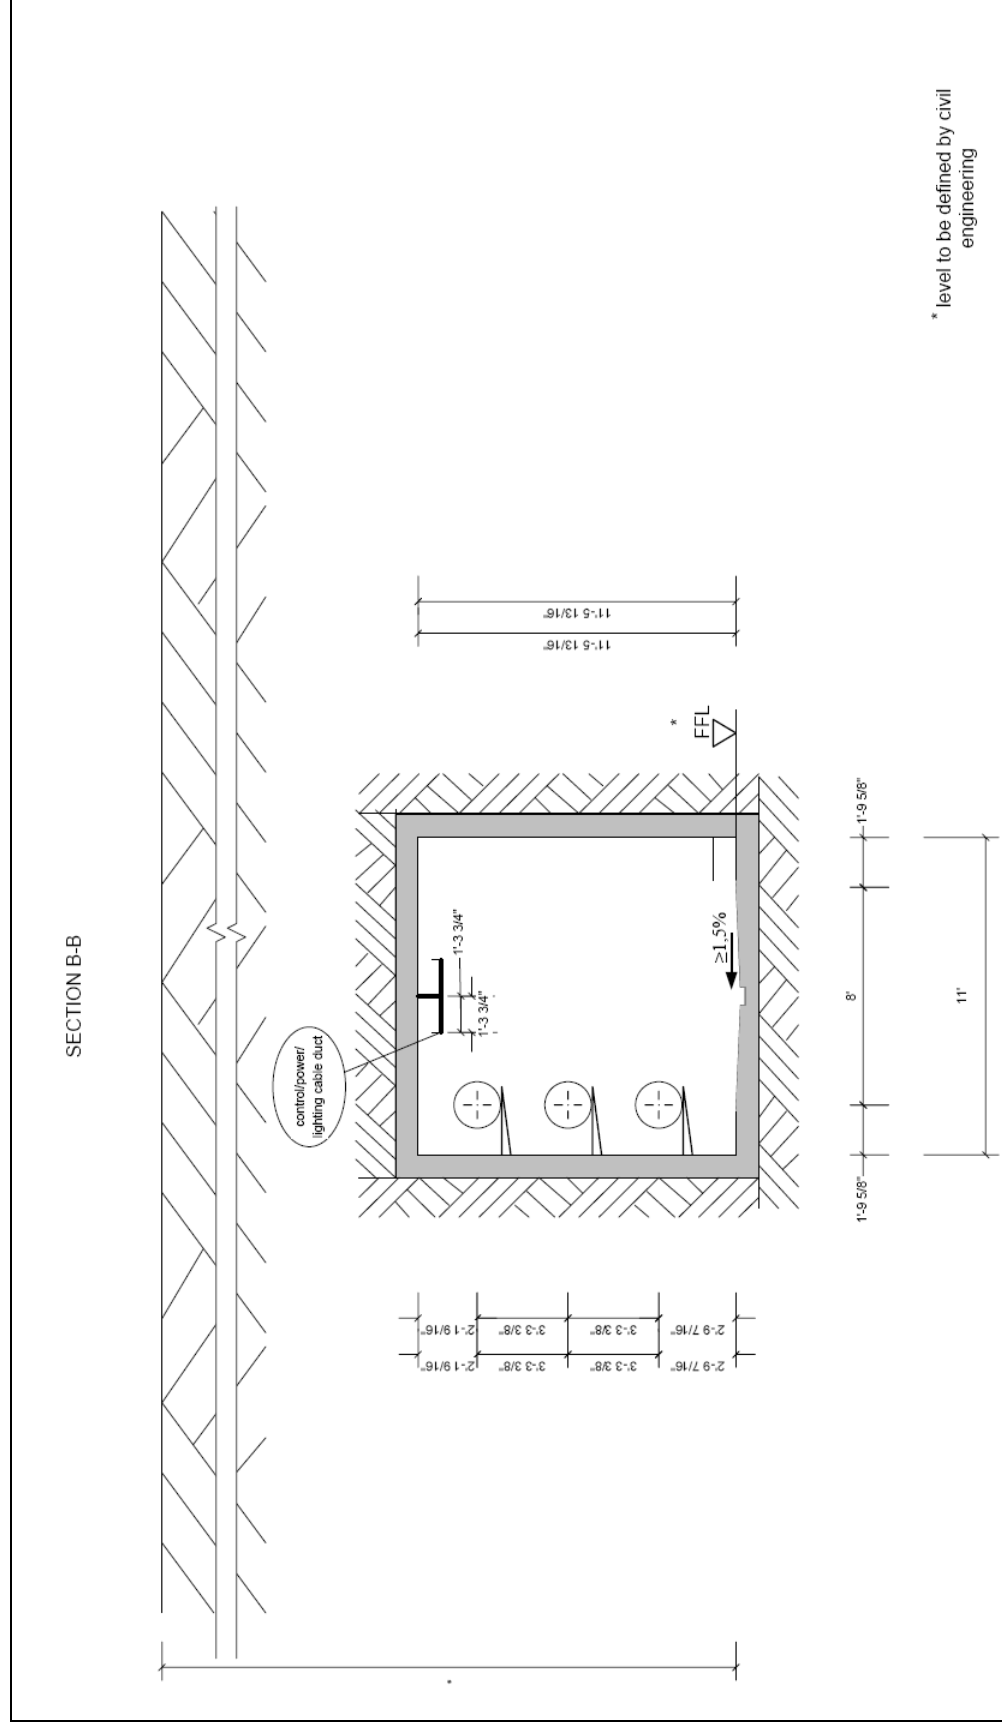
(1 of 3) North Transition Elevations (Typ)
